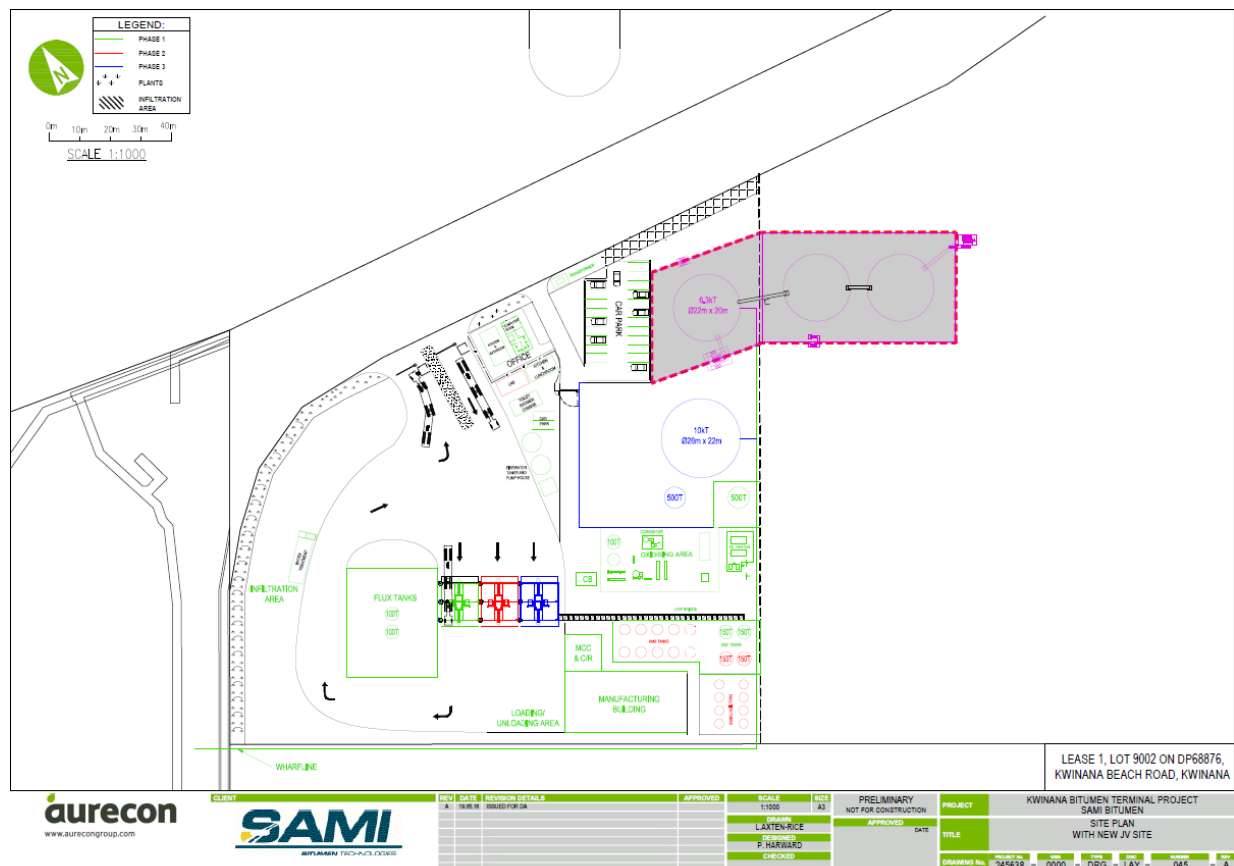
Location of BSS site (highlighted in grey) and storage tanks (Applicant provided)
